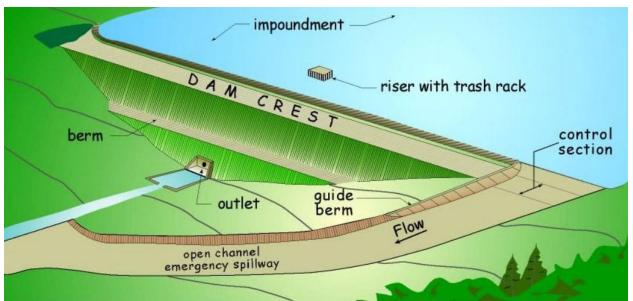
Dam with conduit system as the primary spillway (Open Channel Spillway, n.d.)
